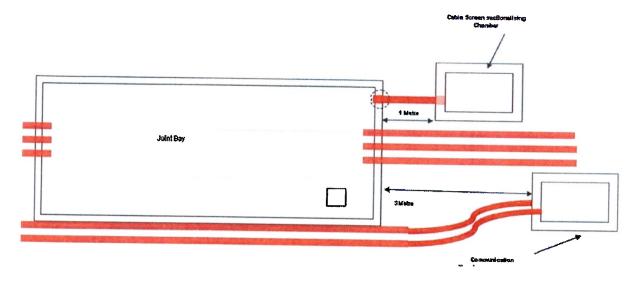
Typical Joint Bay and Link Box Plan Detail
